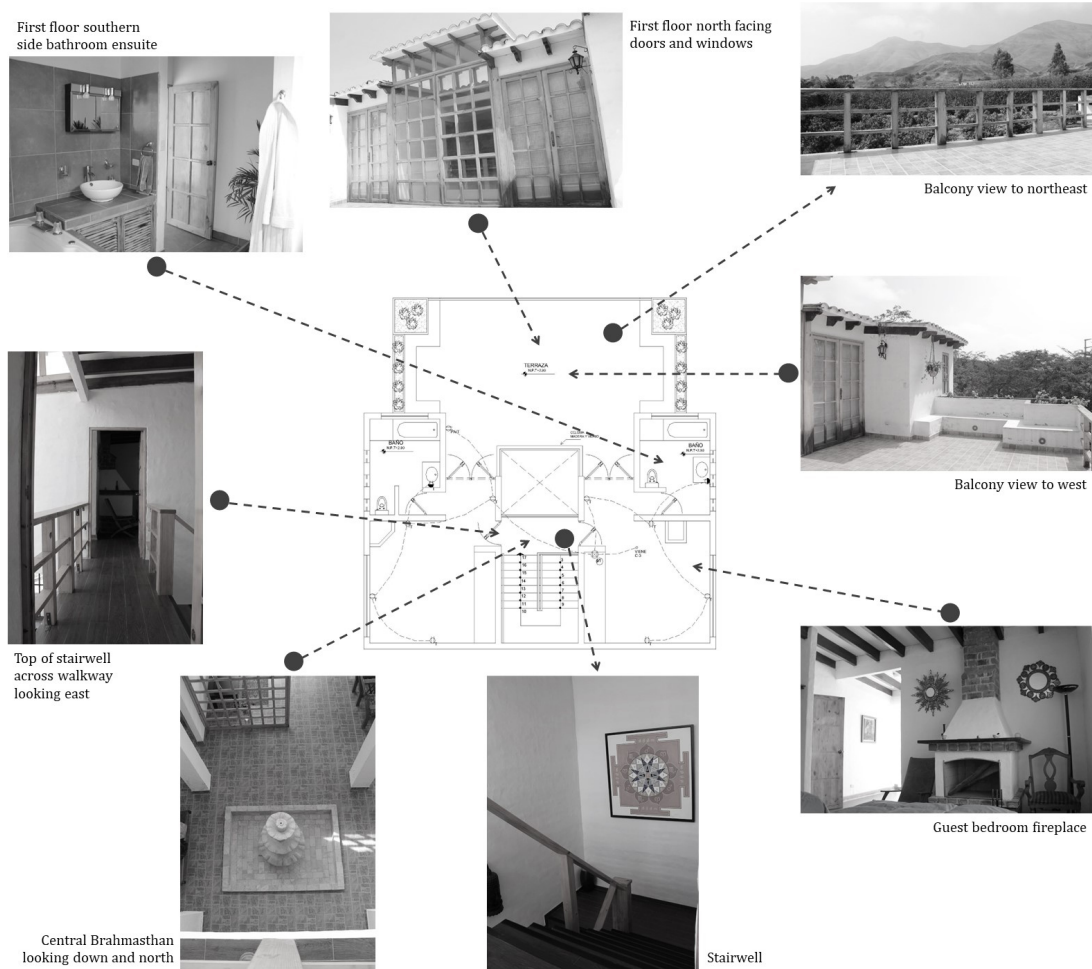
House No. 2 first floor plan in relation to interior and exterior features and views
